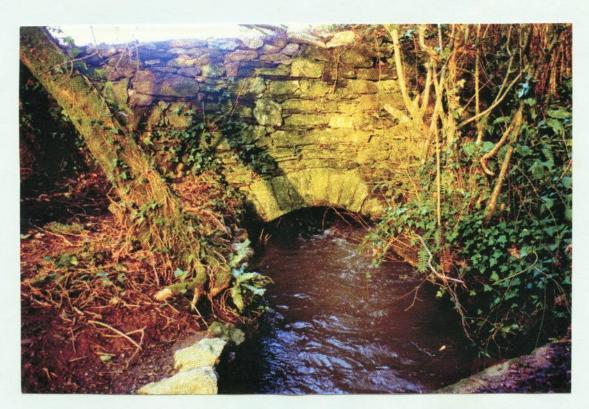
Stone arch carrying deer park wall over Gatcombe Brook, looking north-east.
